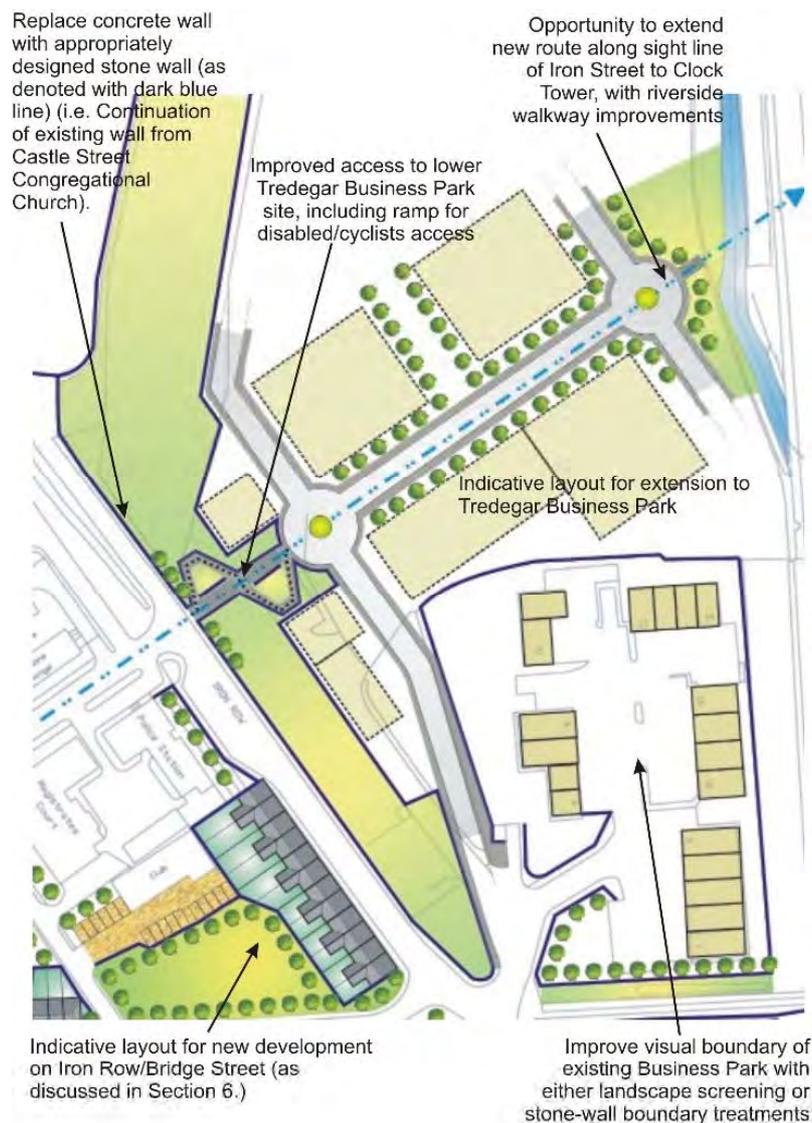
Indicative layout for expanded Tredegar Business Park, illustrating how stone-wall boundary treatments could extend from the Castle Street Congregation Church, with new routes orientated along sight line of Iron Street/Clock Tower with new pedestrian access connection and proposed riverside walkway.
